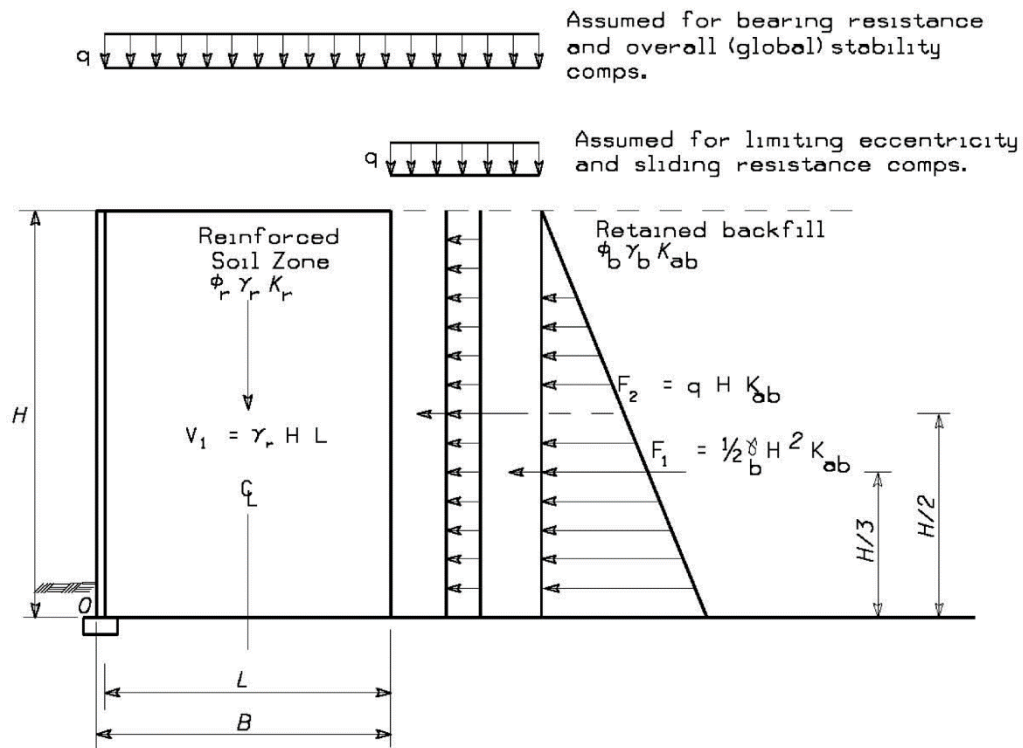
Nominal MSE wall earth pressures for horizontal back slopes.
